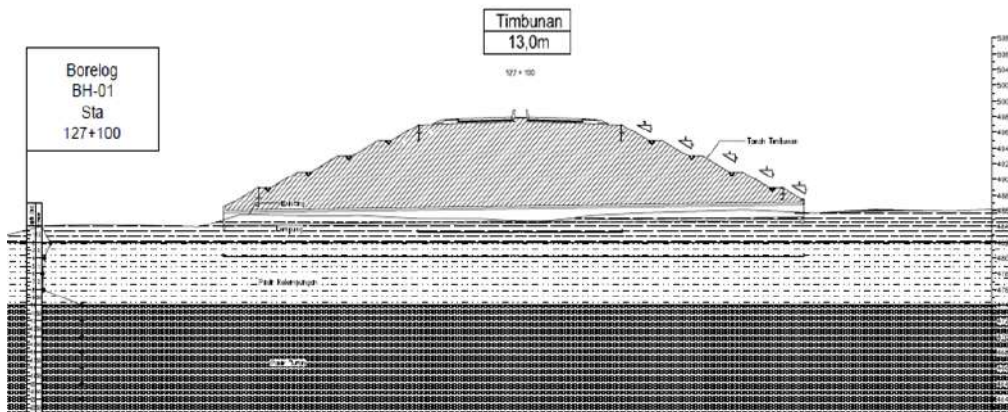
Cross Section STA 127+100 Trans Sumatra Toll Road Kisaran - Tebing Tinggi Section Indrapura – Kisaran
